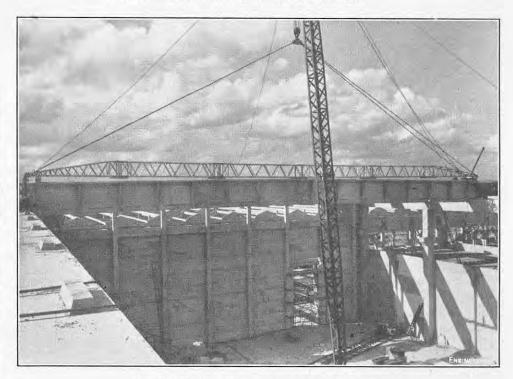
PLACING PRESTRESSED ROOF BEAM.
